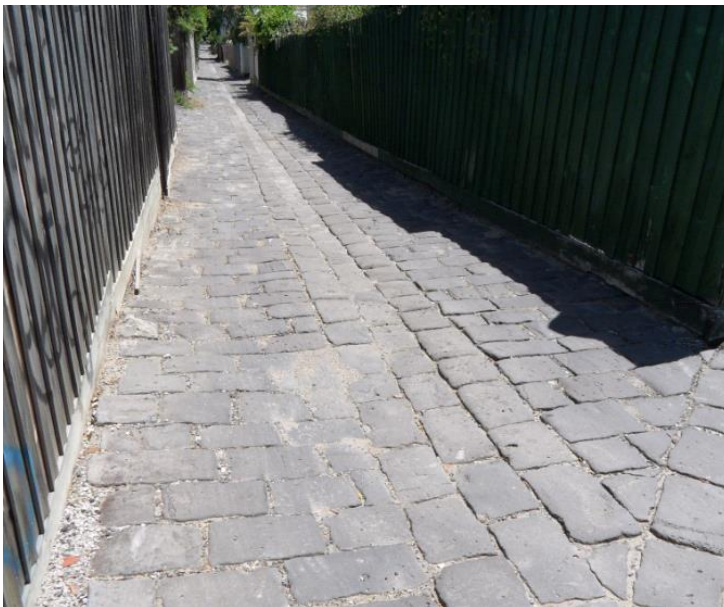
Bluestone pitched laneway behind Auburn Parade at the Newport Crescent outlet. (Source: Context 2018)
